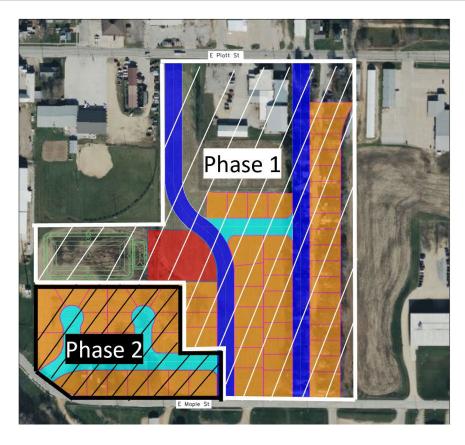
Phasing plan of 1015 E Platt St Subdivision
